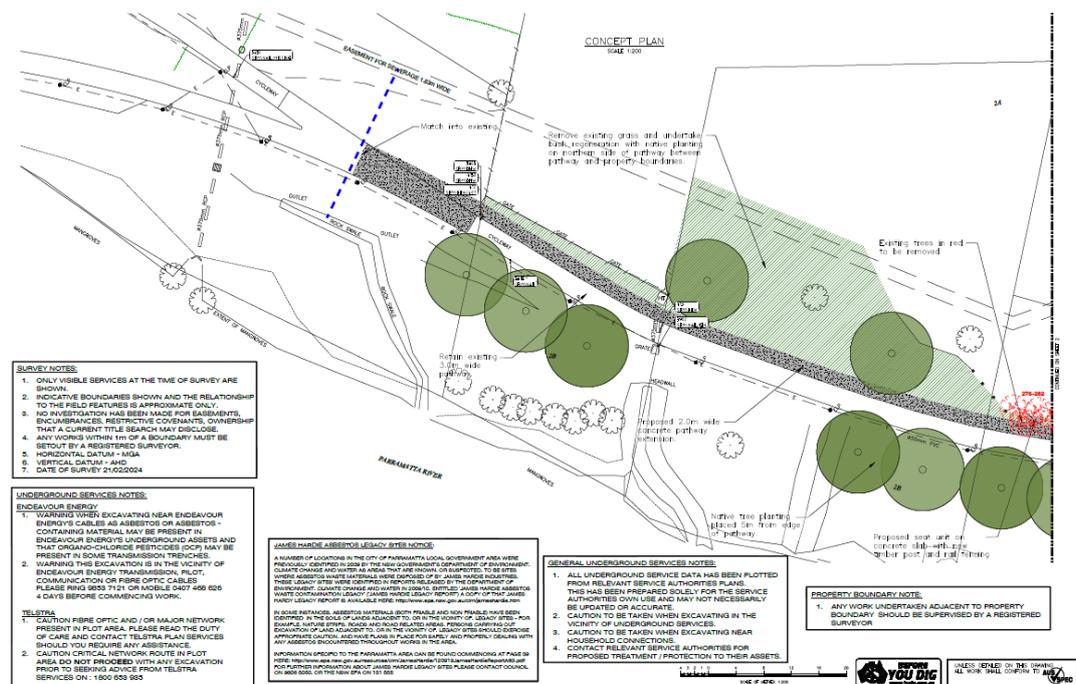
Proposed Landscape Plan (Sheet 1). Source: City of Parramatta Council
